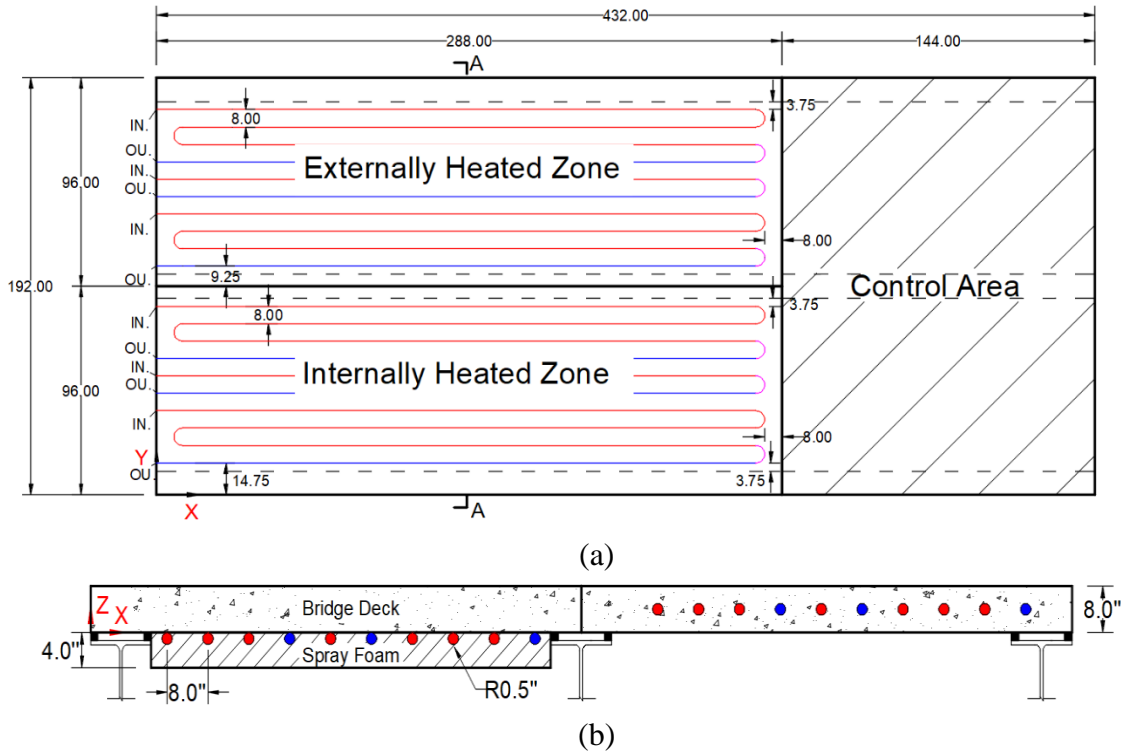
(a) Layout of the heated bridge deck; (b) A-A cross-section view of the bridge deck, left: external heating zone, and right: internal heating zone (unit: in.)
